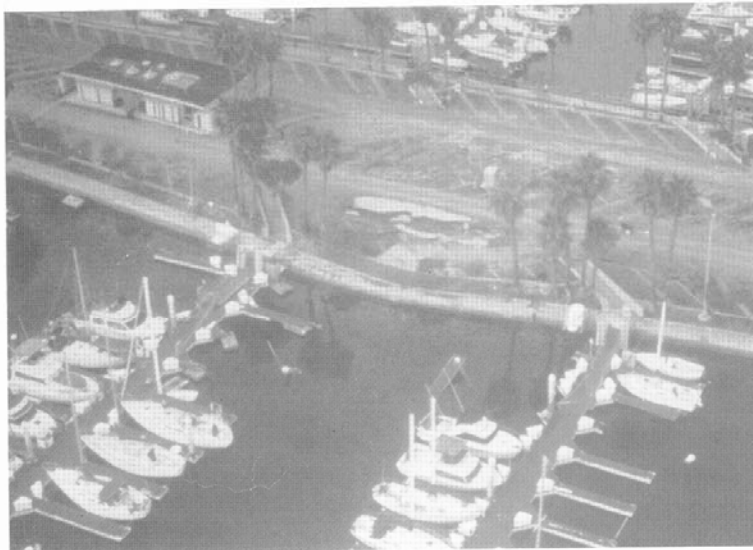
Aerial view of Mole B at King Harbor, Redondo Beach. Note movement of bulkhead wall and ground distress in parking area behind wall. (photo courtesy of Dr. John Tinsley, U.S. Geological Survey)
